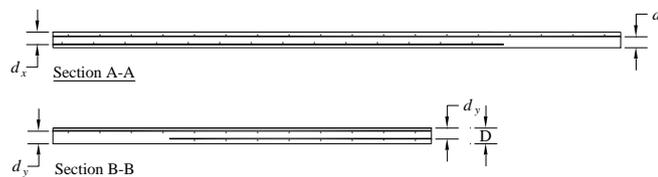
Cross sections of the tested slabs and reinforcement arrangement.
